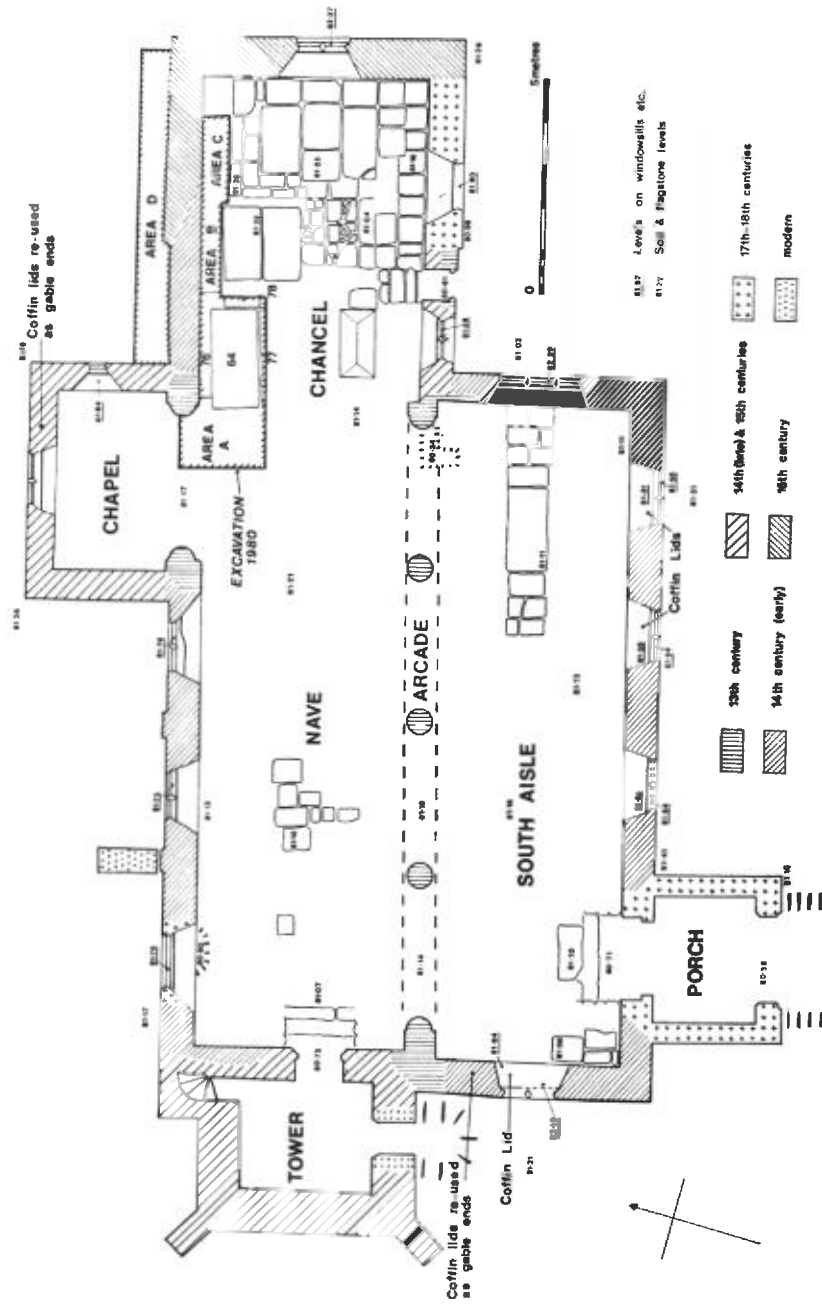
Plan of church showing general periods at ground level and areas excavated in 1980
